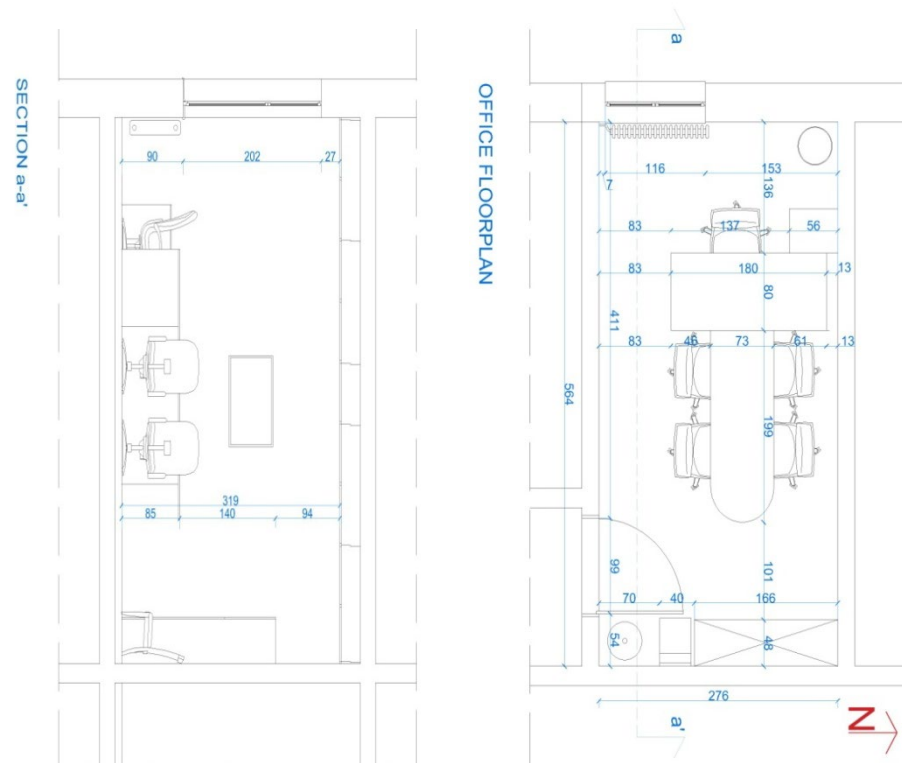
Floor plan and the longitudinal section view of the 2nd floor with the indication of the examined office, present conditions
